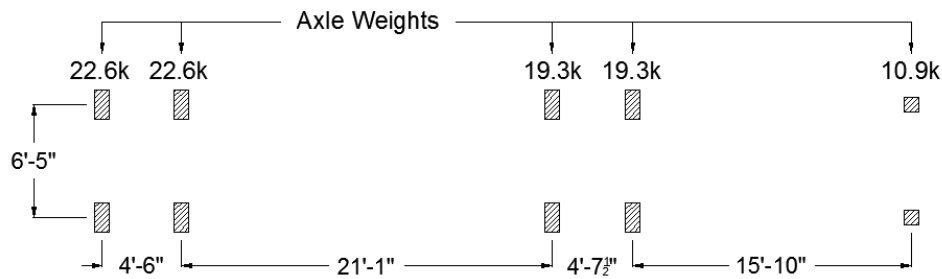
FDOT Custom Test Truck Dimensions and Axle Weights
